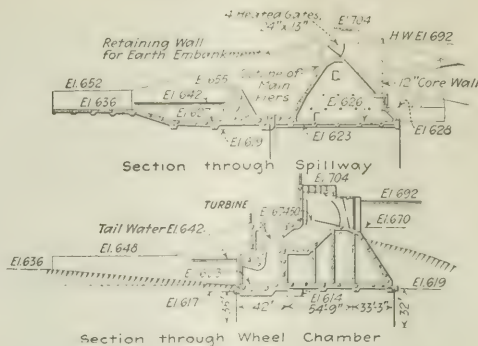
DETAILS OF THE JUNCTION DAM AND HYDRO-ELECTRIC PLANT AT WELLSTON, MICHIGAN
